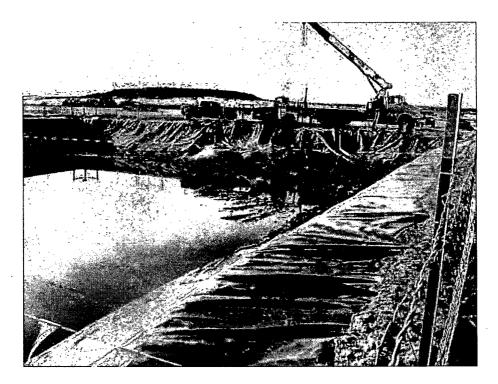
Mud exposed in pit after removing most of the fluid (looking southwest).
